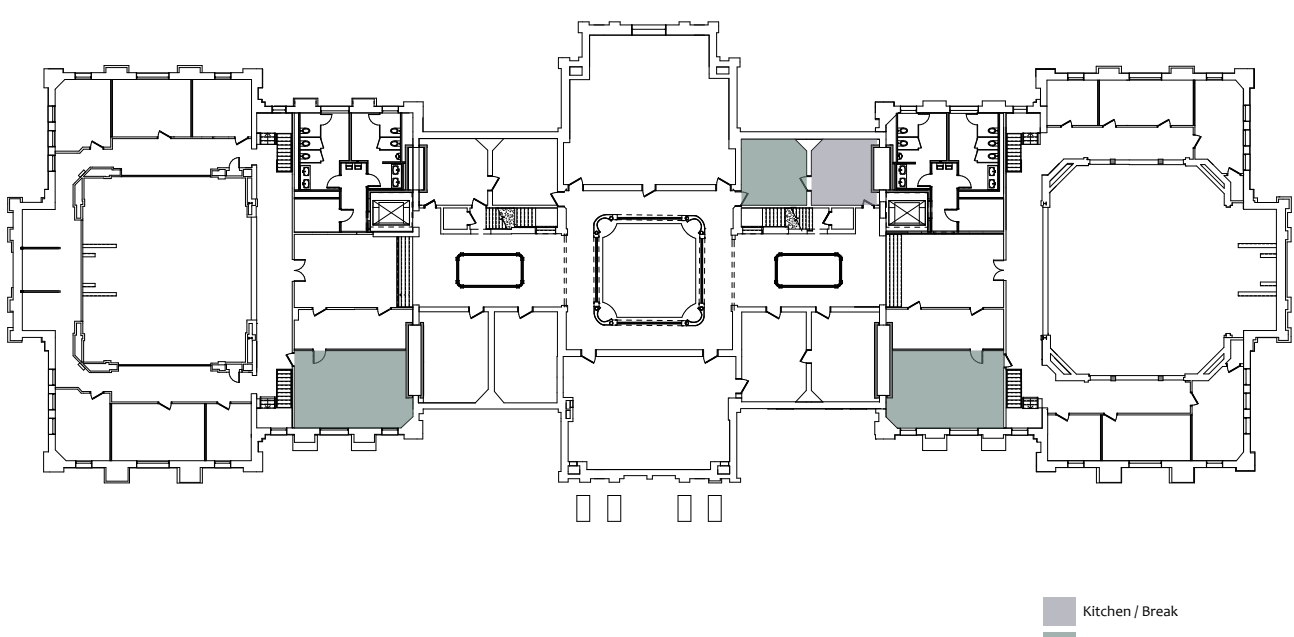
Proposed Kitchen/Break and Copy/Work Rooms - Third Floor [Capitol]
